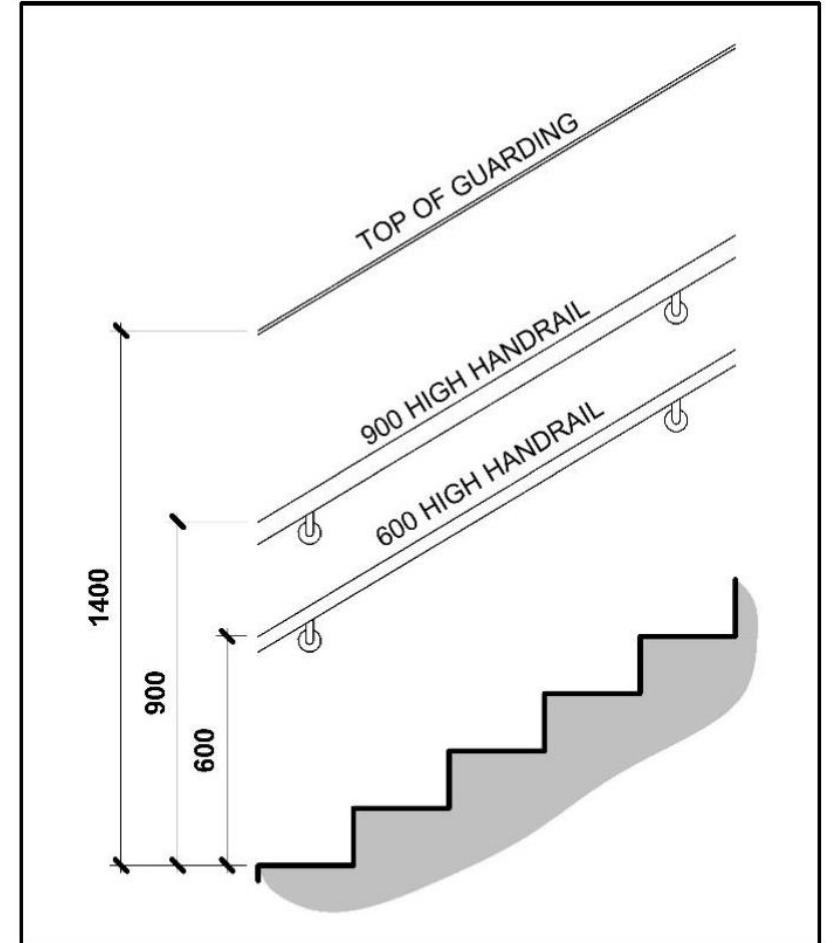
Heights of guarding and handrails above stairs pitch line.
